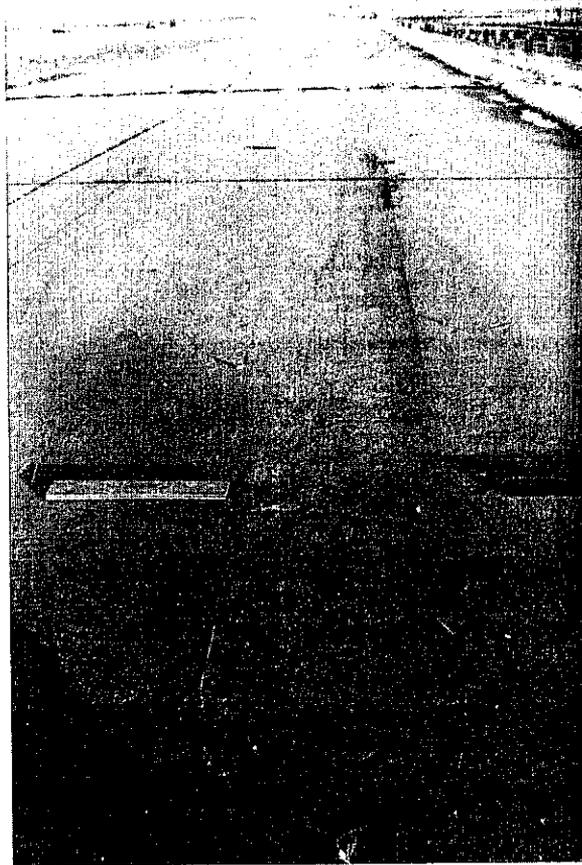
Special Test No. 3 on dry portland cement concrete pavement with regular tires. View after completion of test.
